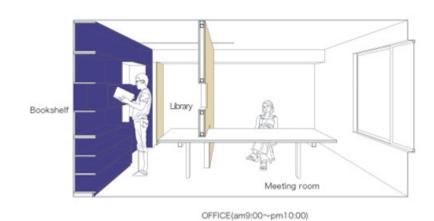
Switch. Bedroom to workroom / office extension Source: (Etherington, 2010)
